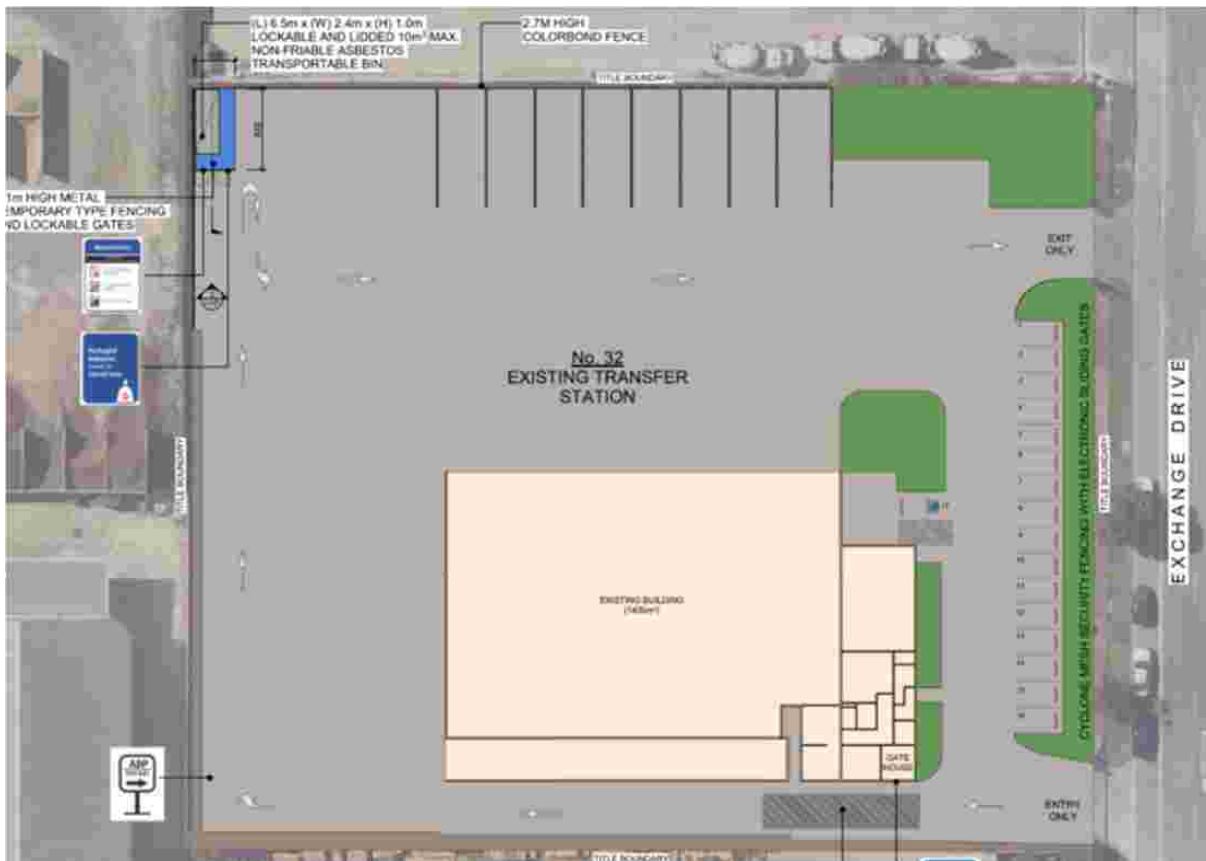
From Land Use Site Plan, Ref 12840 LU-01A Asbestos Disposal Point area in blue.
